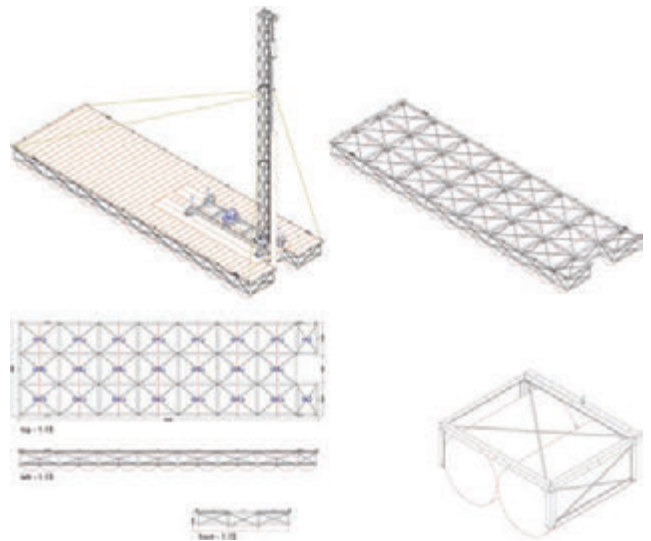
The pile driver on the floating pier; the complete 3D Truss; pile driver views; a modular component of the floating pier.
